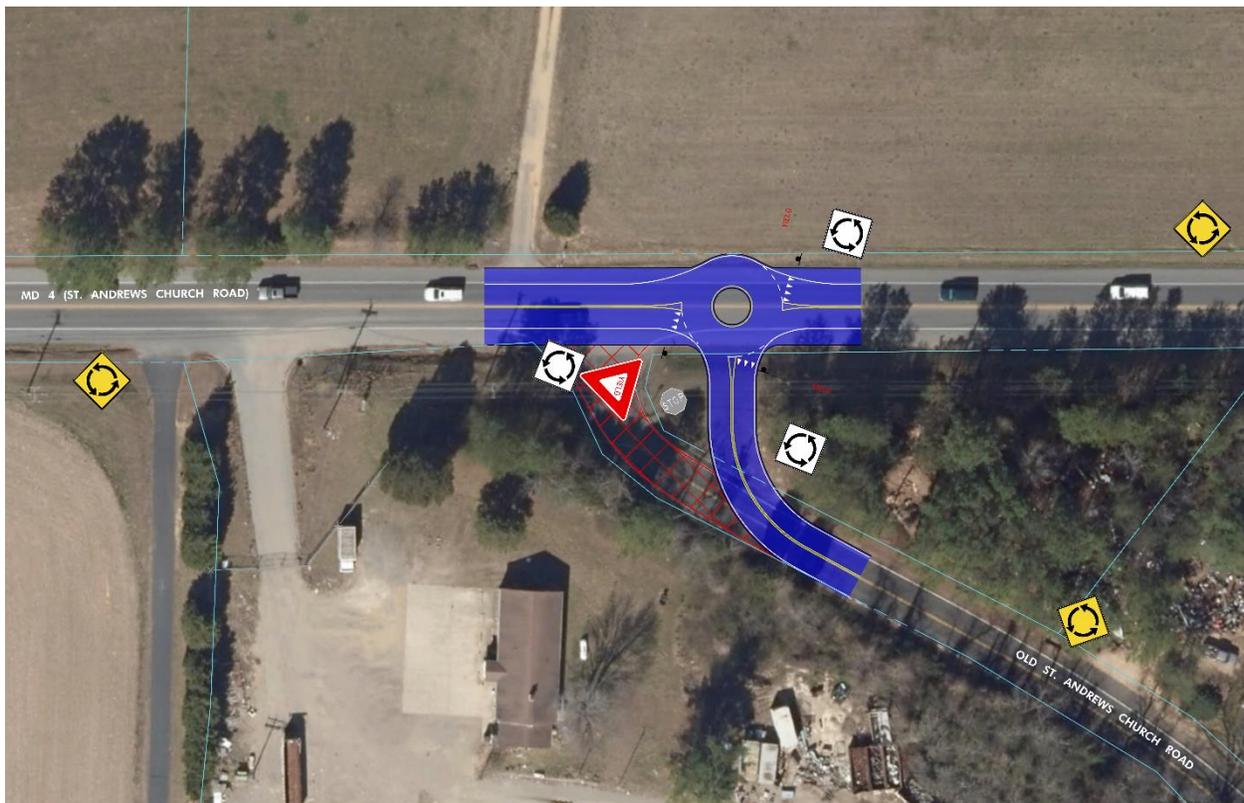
Proposed Improvements at West Leg of Old St. Andrews Church Road
